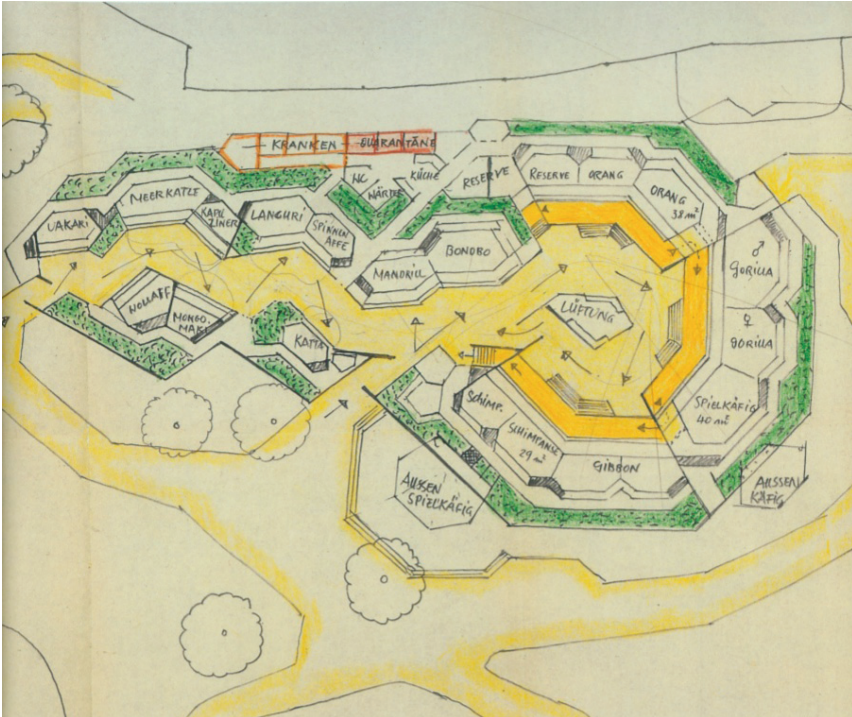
"Ape House, Floor plan, Zoological Garden of Basel," draft by Kurt Brägger. Source: Archiv Nachlass K. W. Brägger, Riehen
